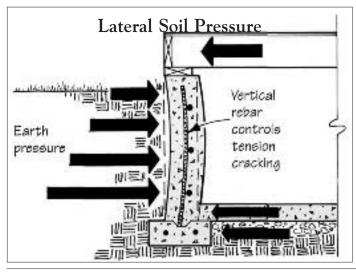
In all but the sandiest soils, the pressure of the earth can bow and crack a concrete foundation wall. Vertical rebar strengthens the wall and prevents cracks from developing on the inner face.
